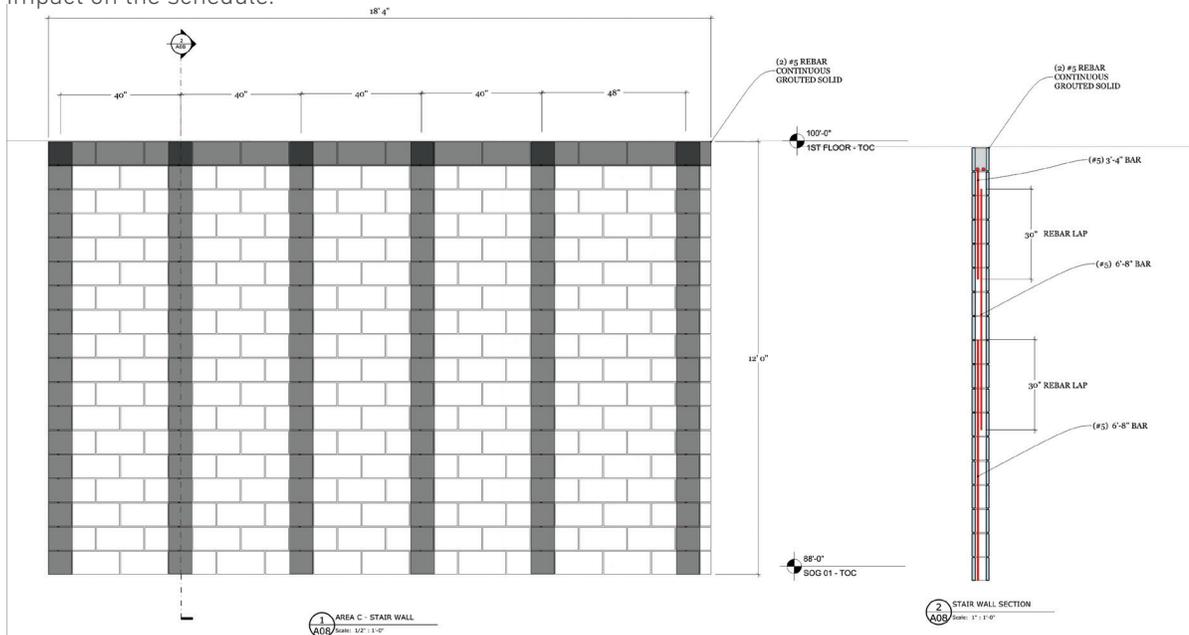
St. Augustine 2D lift drawing showing grout, rebar and bond beam locations generated from 3D SketchUp model
